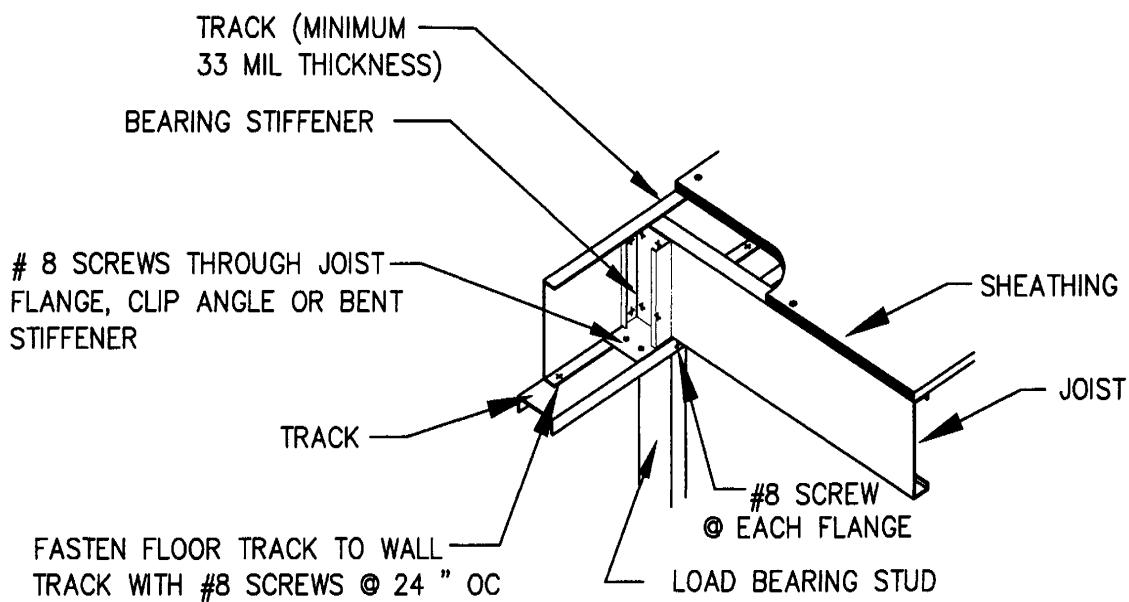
Floor to Exterior Load Bearing Wall Connection
